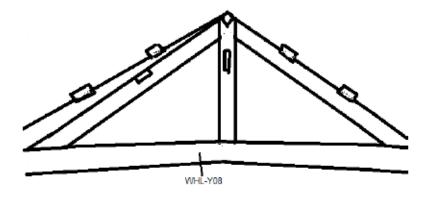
Sketch of truss 3, showing the location of sample WHL-Y08
